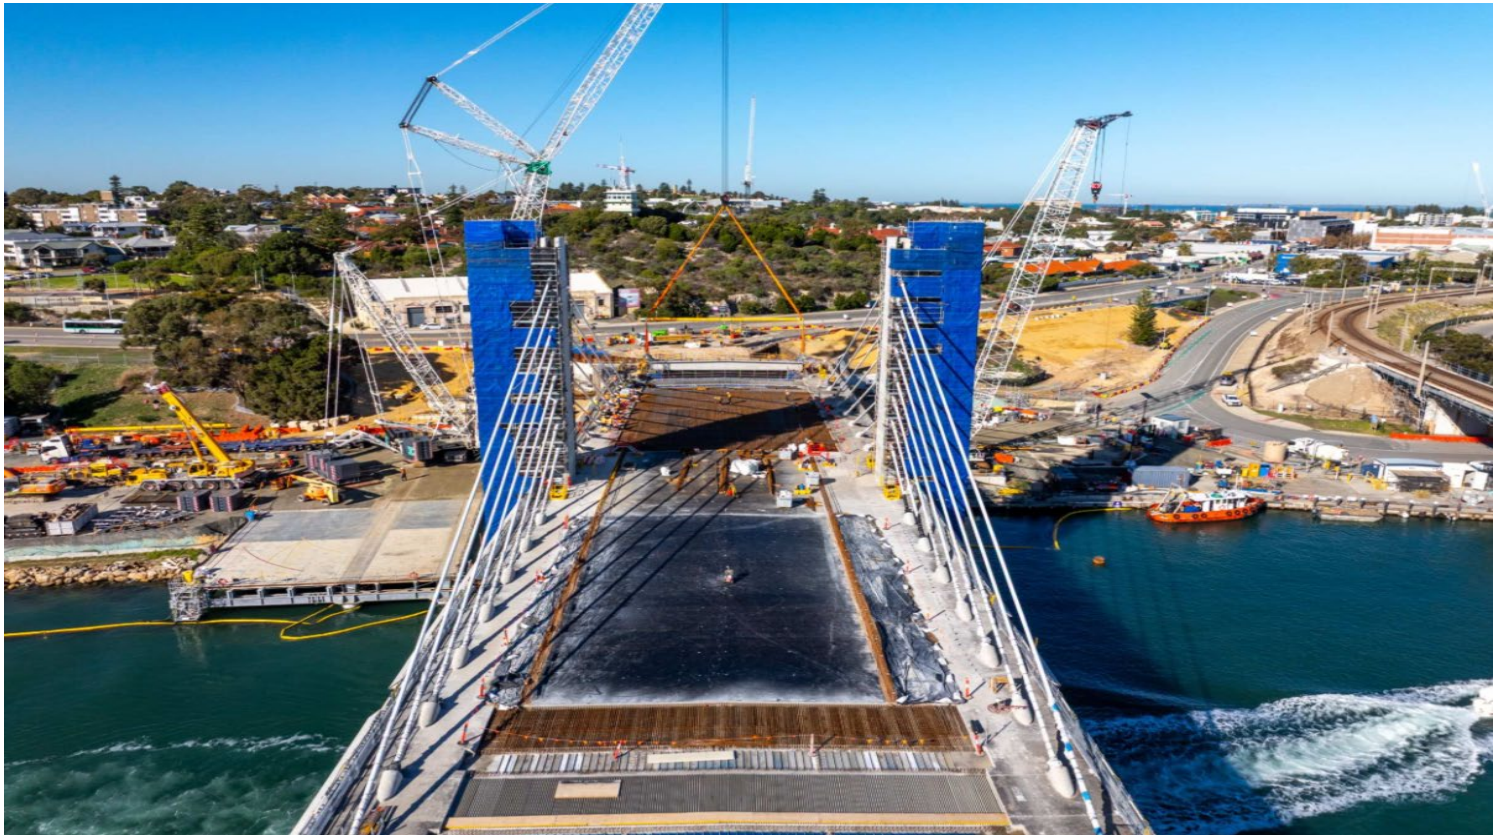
All beams installed on the new Fremantle Traffic Bridge.
